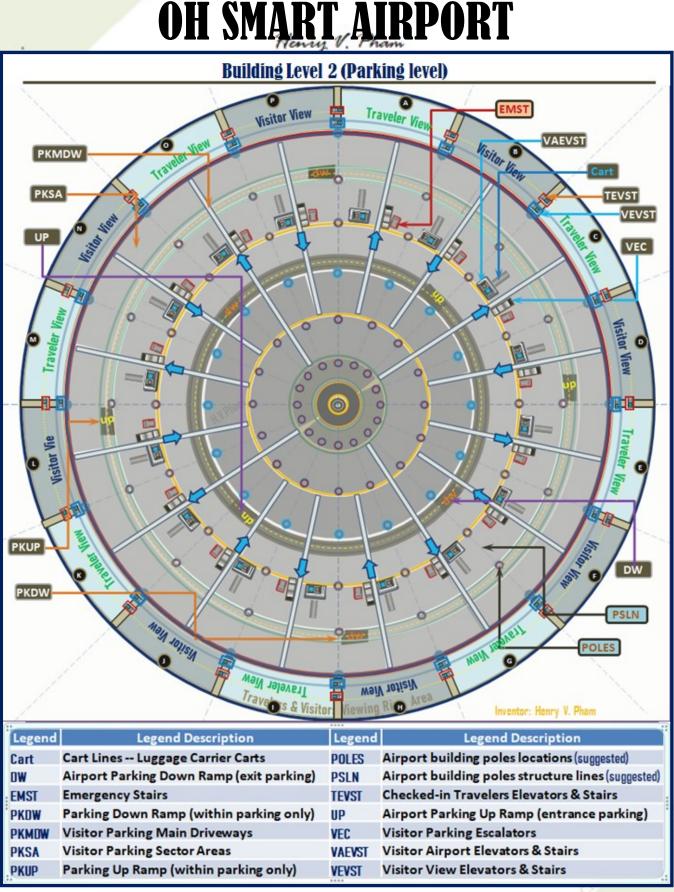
OH SMART AIRPORT -Building Level 2 Layout
